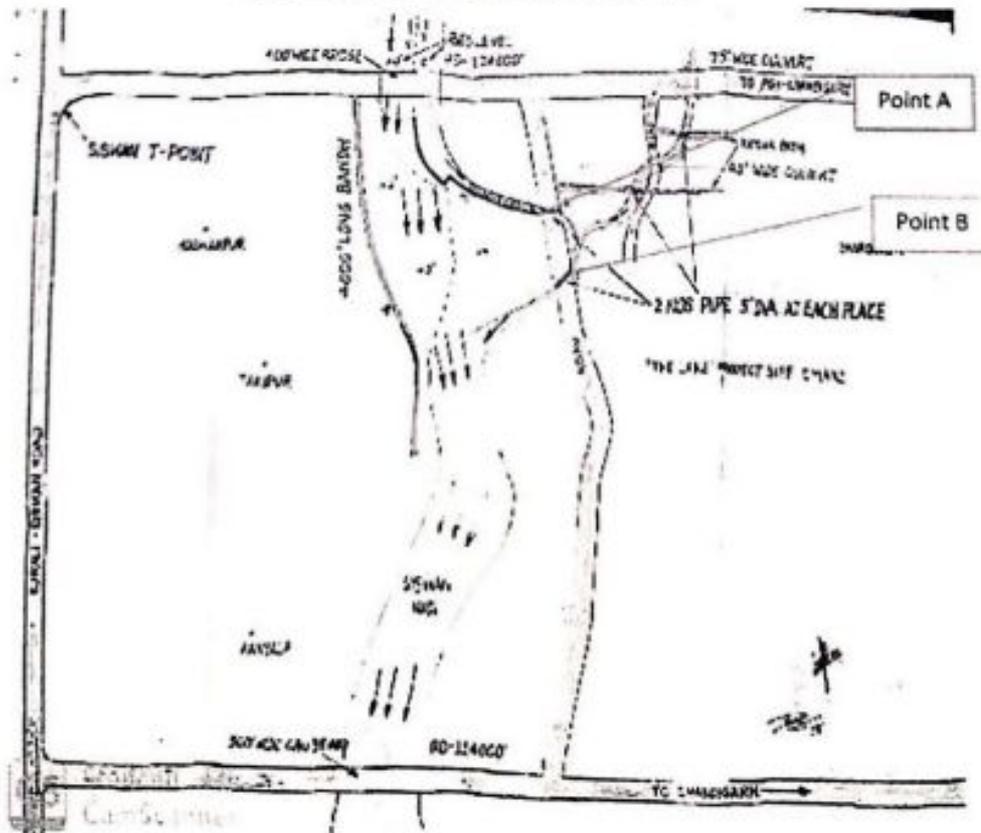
Two pipes of 5 feet Diameter provided at crossing point 'A'
